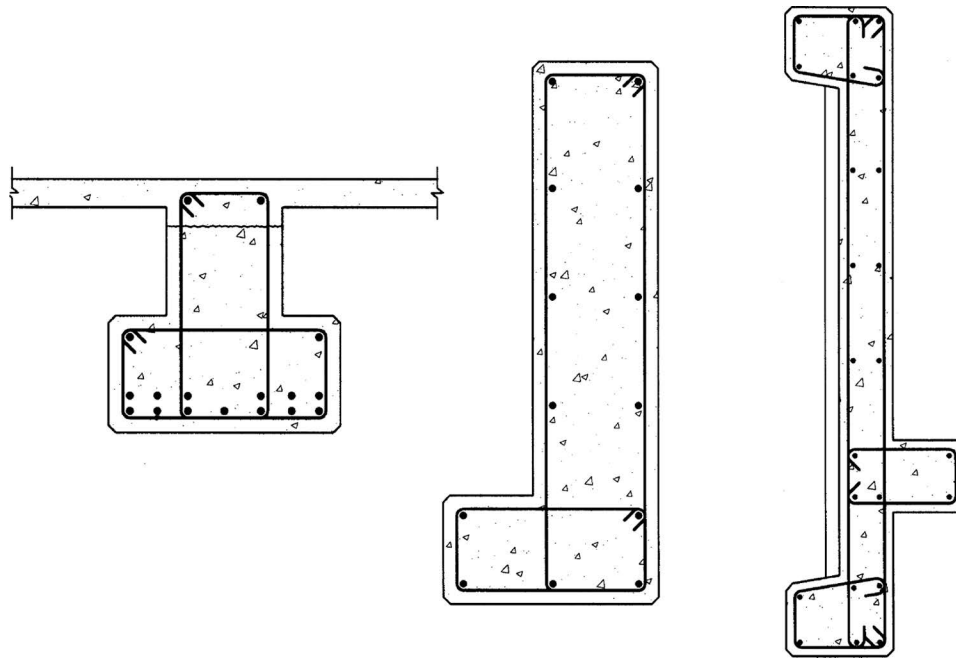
Examples of transverse torsional detailing in precast concrete members.
